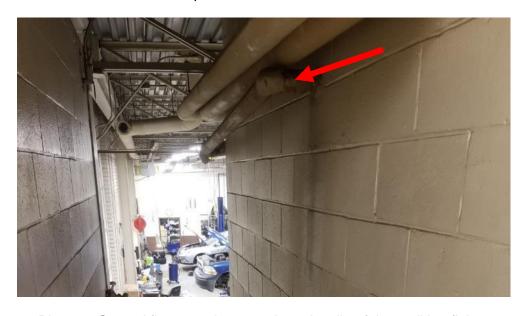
Ground floor, service area, in stairwell, 1 fair condition fitting.
